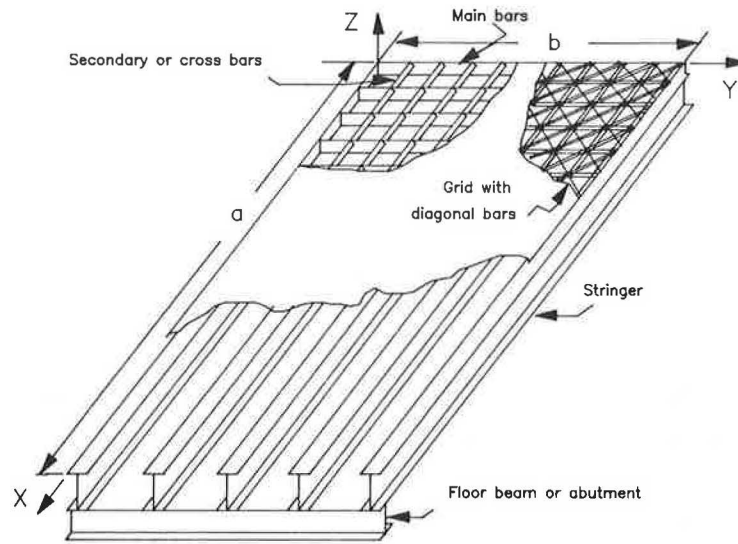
Open-deck-wide-flange stringer bridge system.
